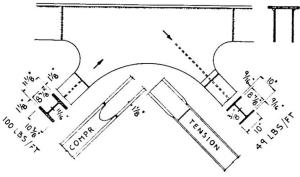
(left) and 4 (right). Specially shaped gusset plates for welded nodes.
